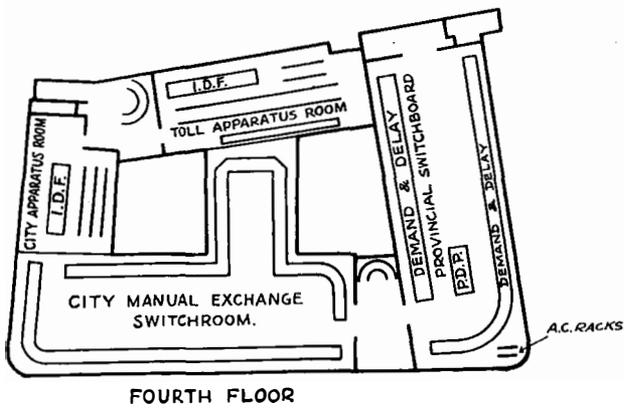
PLAN OF FLOOR LAY-OUTS.
